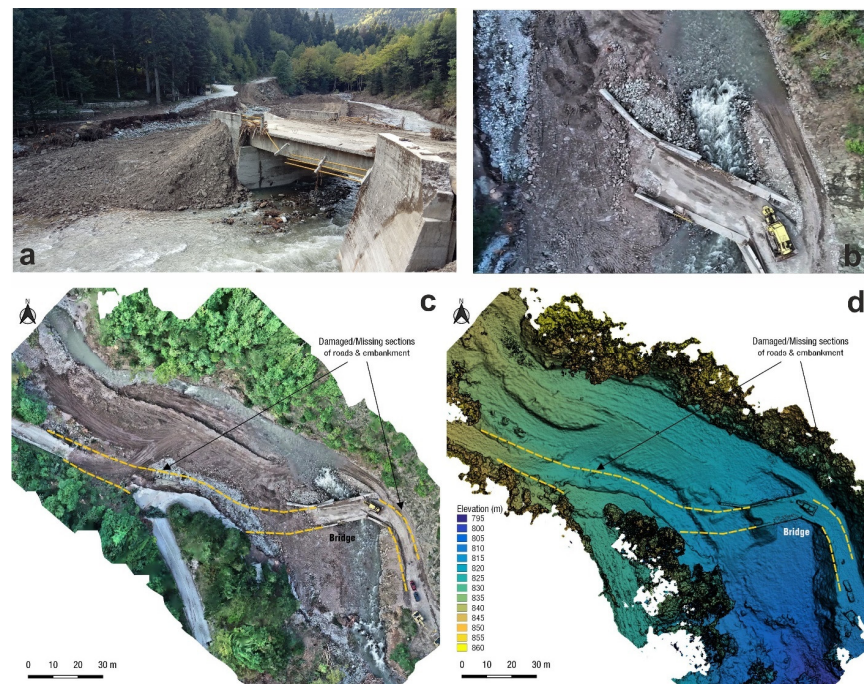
Damaged bridge crossing of Karitsiotis River near Belokomiti. Ground (a) and vertical aerial (b) images of the damaged bridge undergoing repairs on 1 October 2020. UAS orthophoto (c) and digital surface model (d) of the Karitsiotis River bridge area (surveys 1 October 2020).
